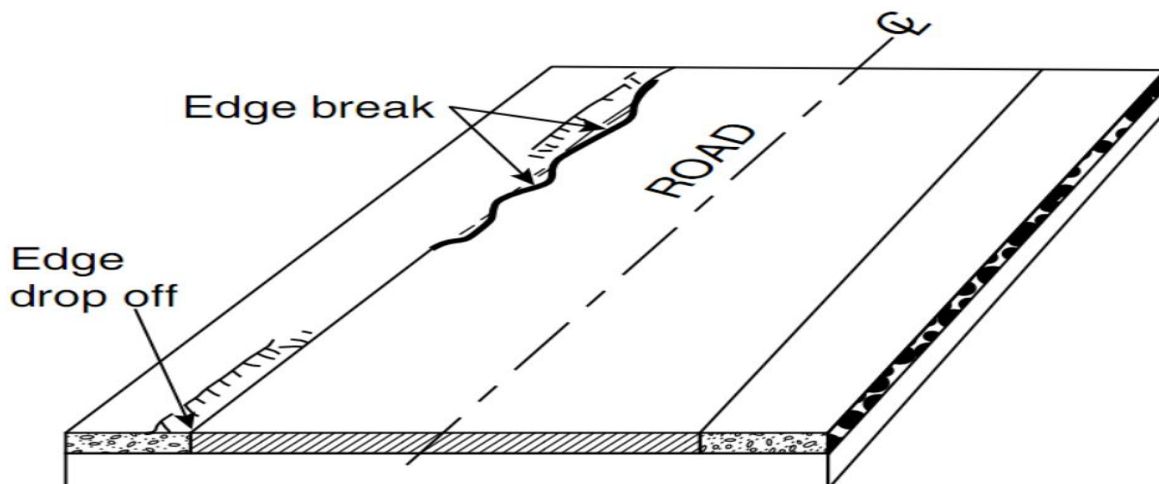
Sketch of edge defects in flexible pavements (Source: Austroads, 1991).
